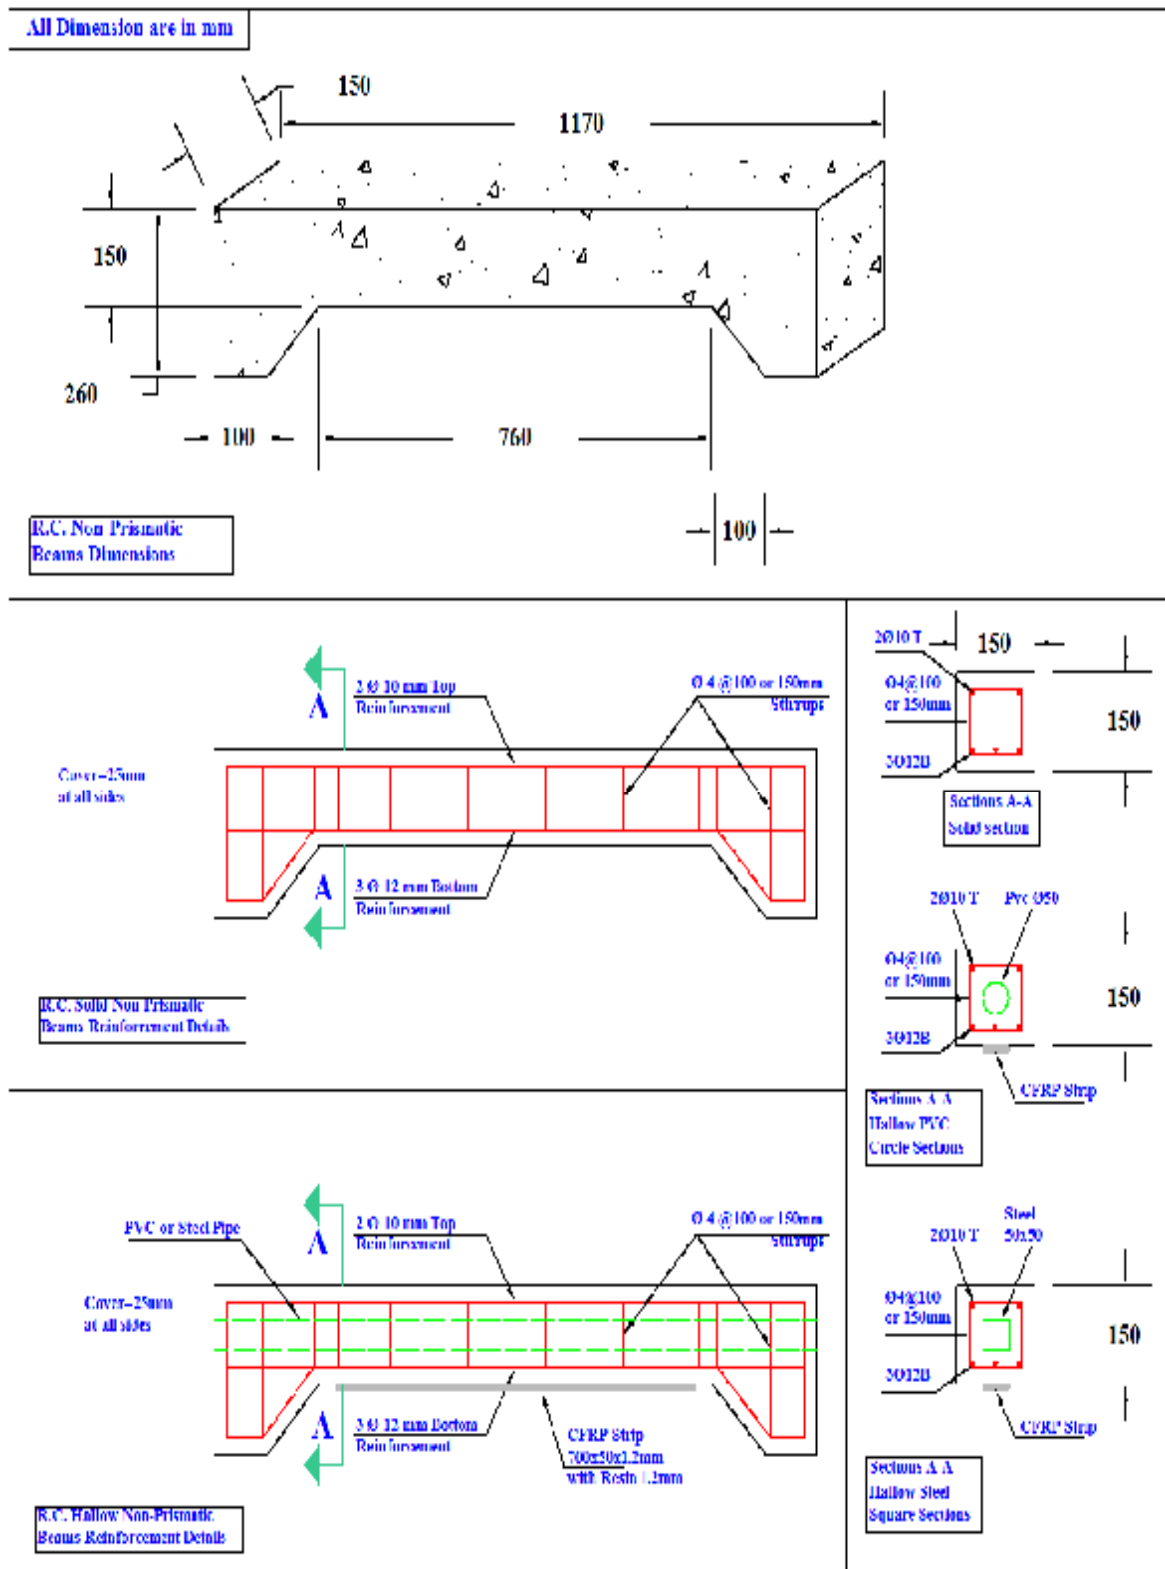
Details of Non-Prismatic R.C. Beams Sections.
